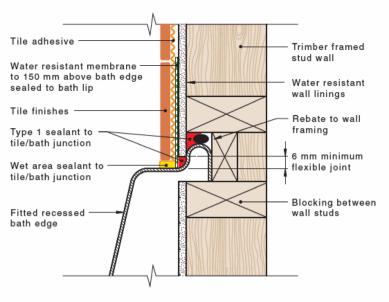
(D) — Bath with no shower over it — Fitted bath — Timber-framed wall
